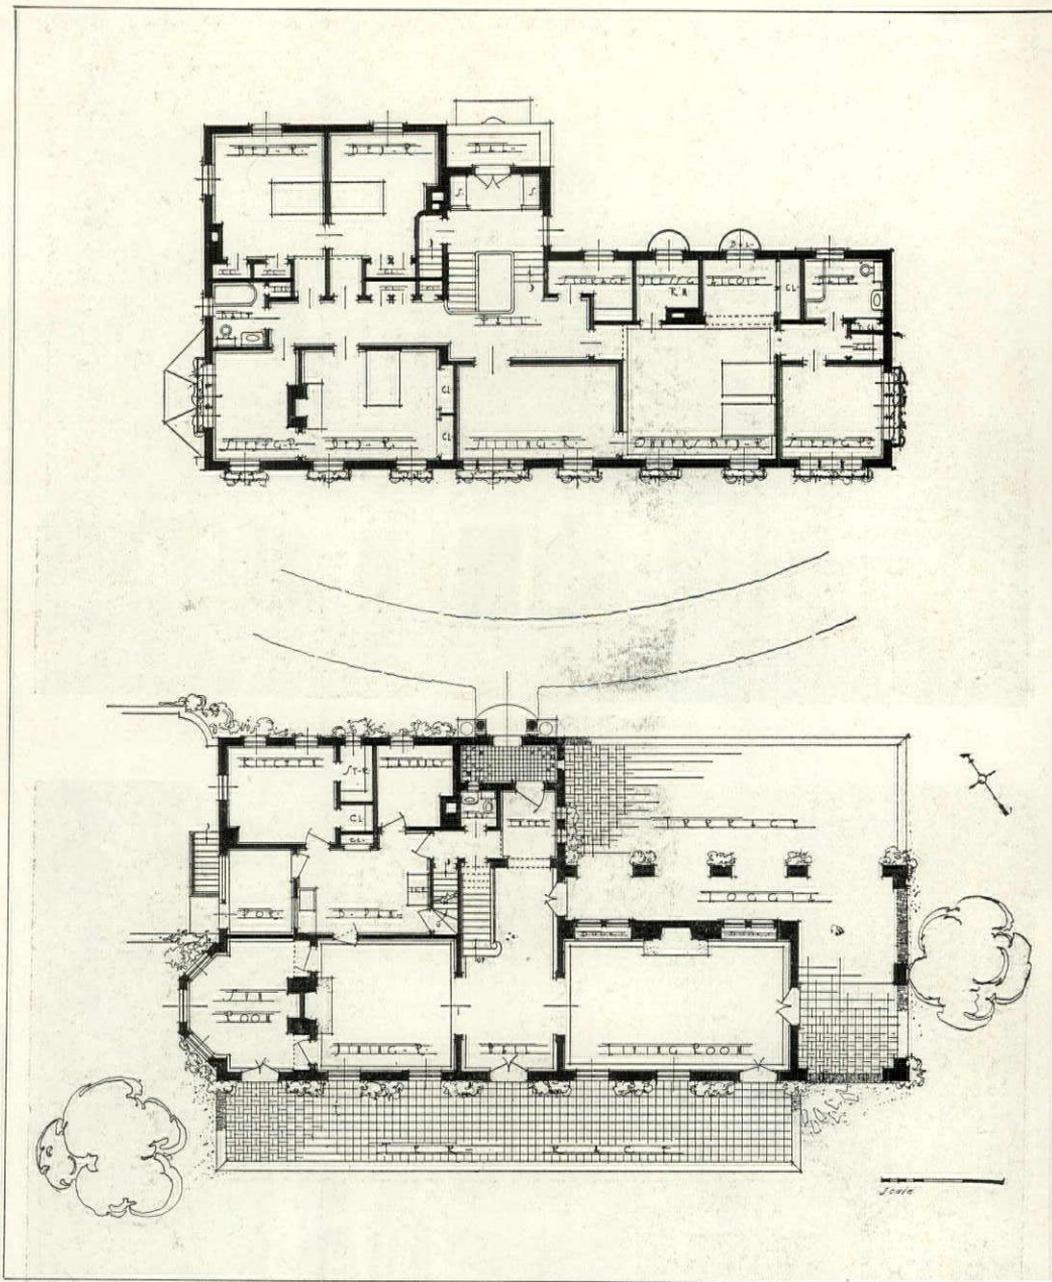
FIRST AND SECOND FLOOR PLANS—
